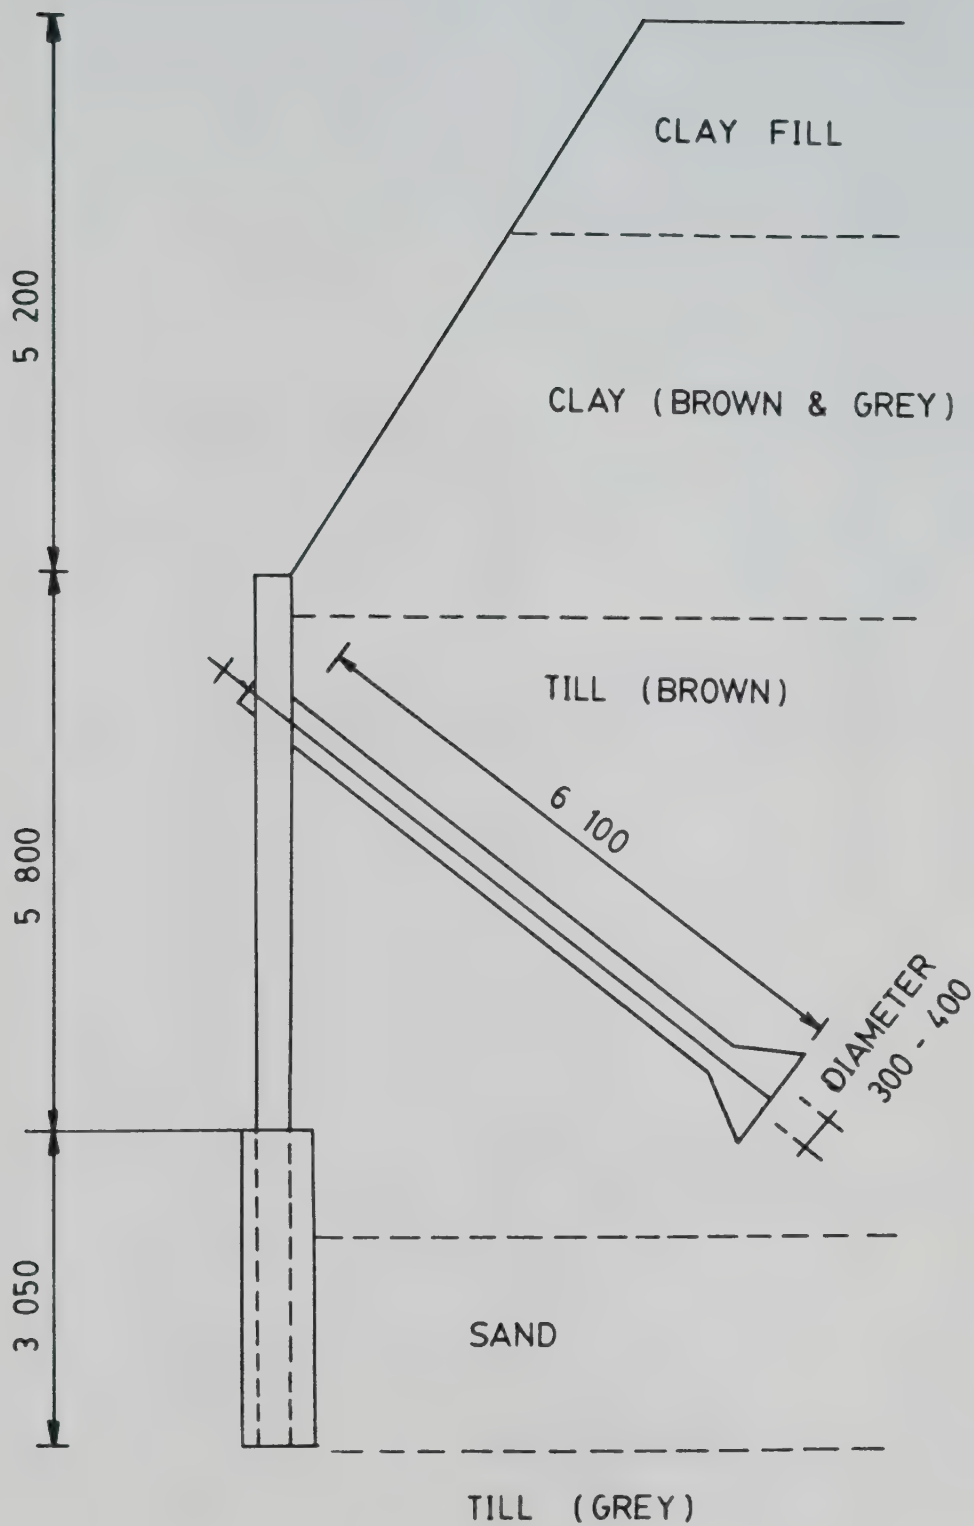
Cross section through the H pile wall at 106 Street and 100 Avenue (Sego, 1982)
